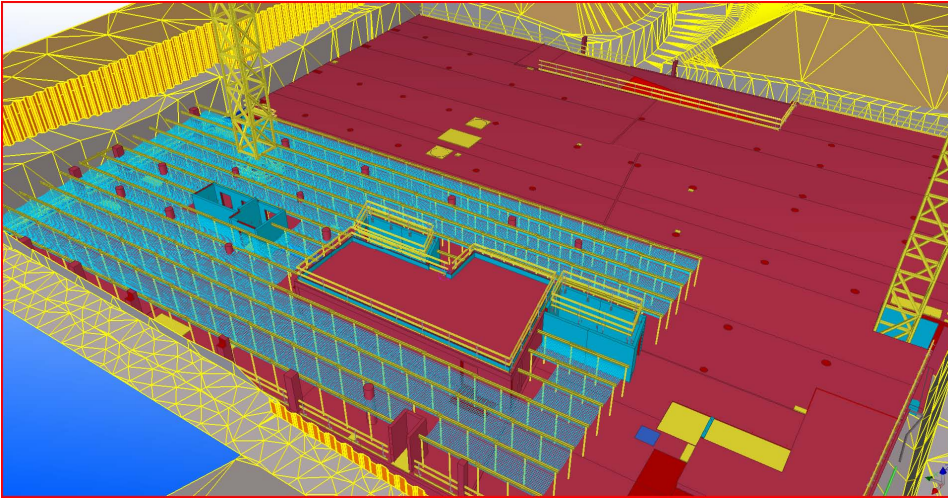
In the third phase primary beams of the floor mould system and safety nets are installed.
